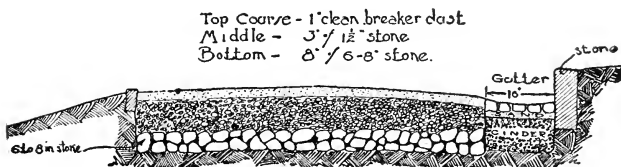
Cross section of a waterbound macadam driveway to show its construction. Note the rubble stone gutter and the cut stone curb used in this particular drive
